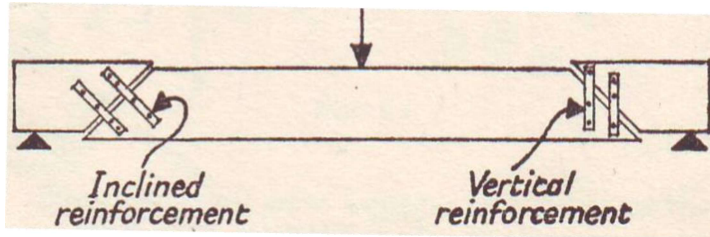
Conceptual view of vertical and inclined shear reinforcement.
